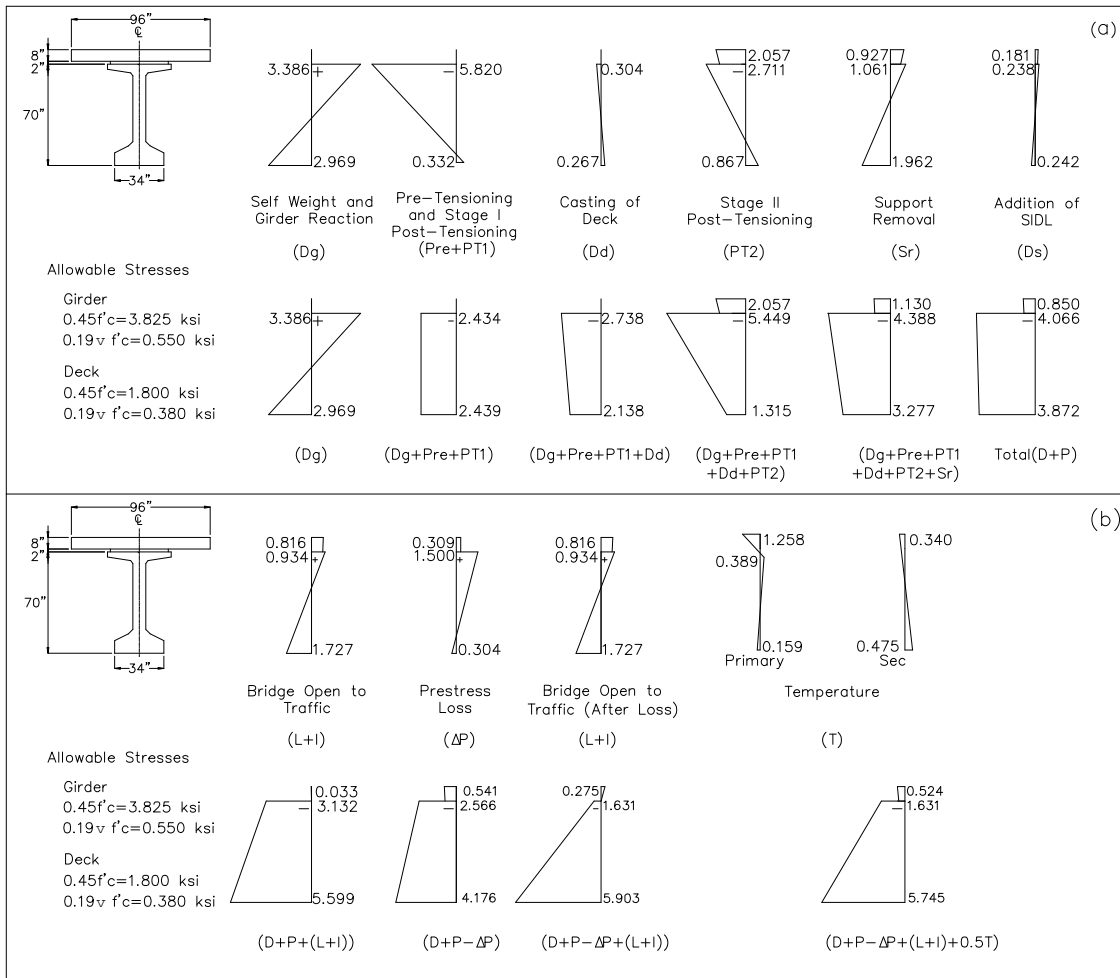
Stress Check at Section C-C (Over Pier) for (a) Construction and (b) In-Service before and after Losses.
